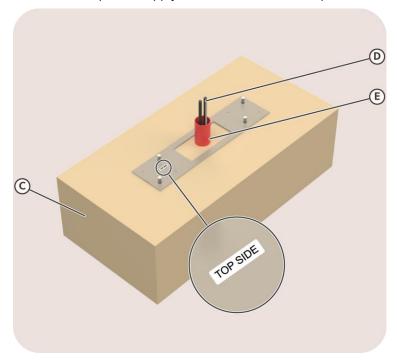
Example of a solid foundation (C), with cables (D) in a flexible conduit system (E)
